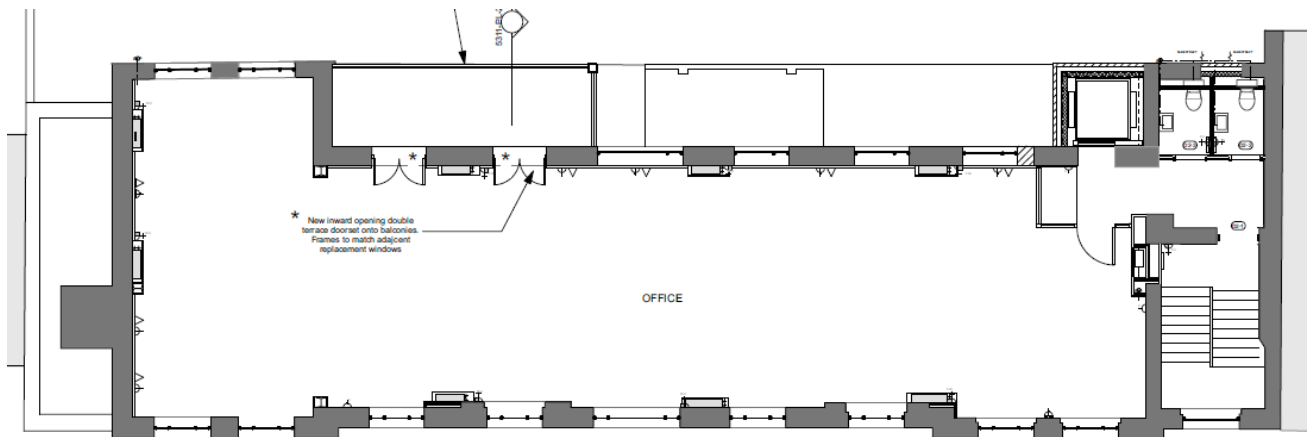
Proposed third floor plan showing proposed balcony. Balcony to be level with rear wing.
